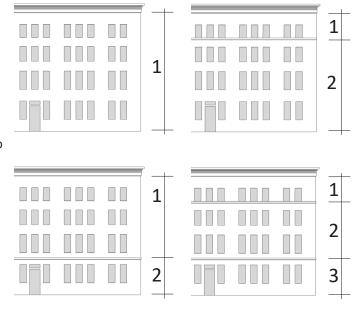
C.1.b: FAÇADES divided into 1, 2, and 3 horizontal layers
